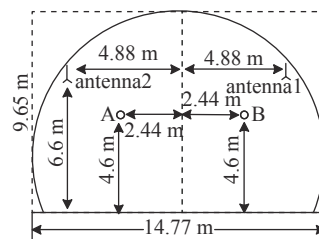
Cross section diagram of railway single-hole and double-track tunnel
